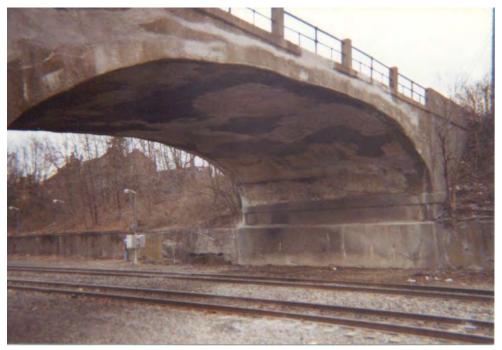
Looking southwest at the north face of the west span arch and spandrel wall. Note: Large area of concrete repairs to spandrel wall and arch ring under repair contract in 2000.
